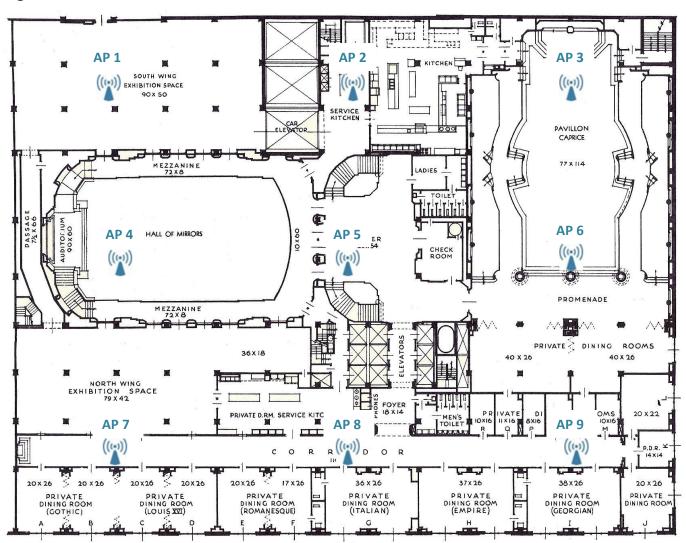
Hotel First Floor – AP Placement for Use Case 2
